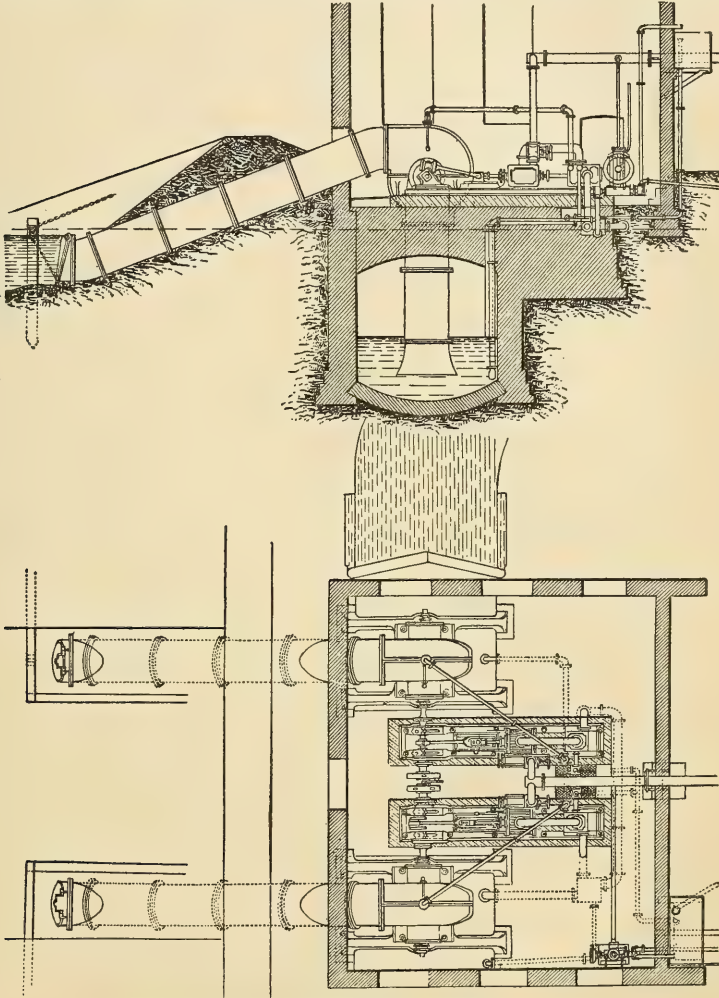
Arrangement of Centrifugal Pumping Machinery—Gwynne & Co.
